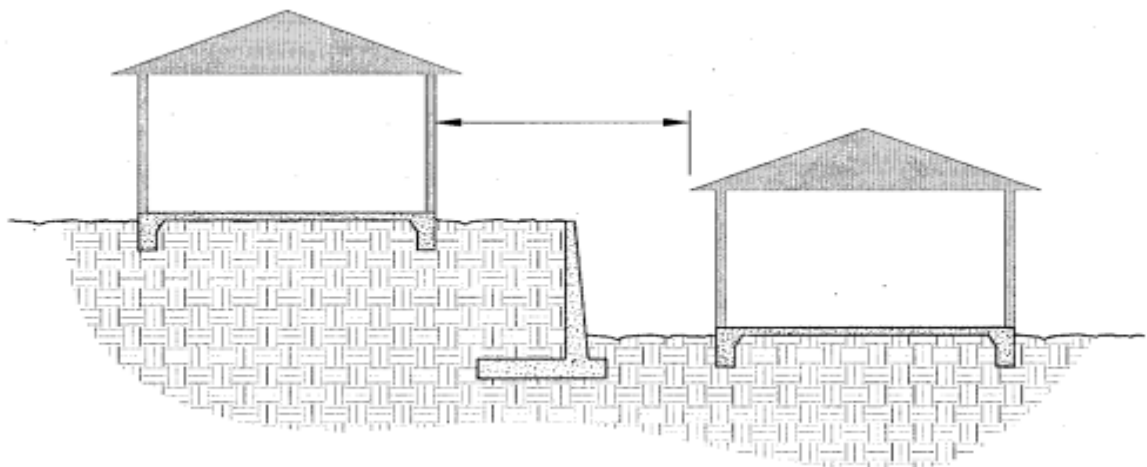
Section showing the use of a cantilever retaining wall between two structures rather than a slope (Figure 1.2) to allow the structures, such as those of a residential tract development, to be spaced closer together resulting in more developable land.
